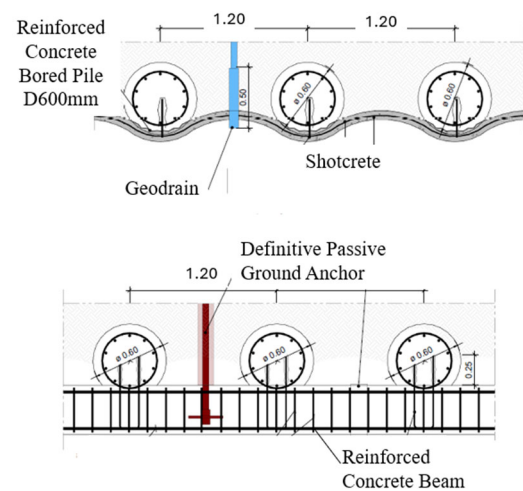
Cross-section of the retaining structure in the area between floors and at the distribution beam.
